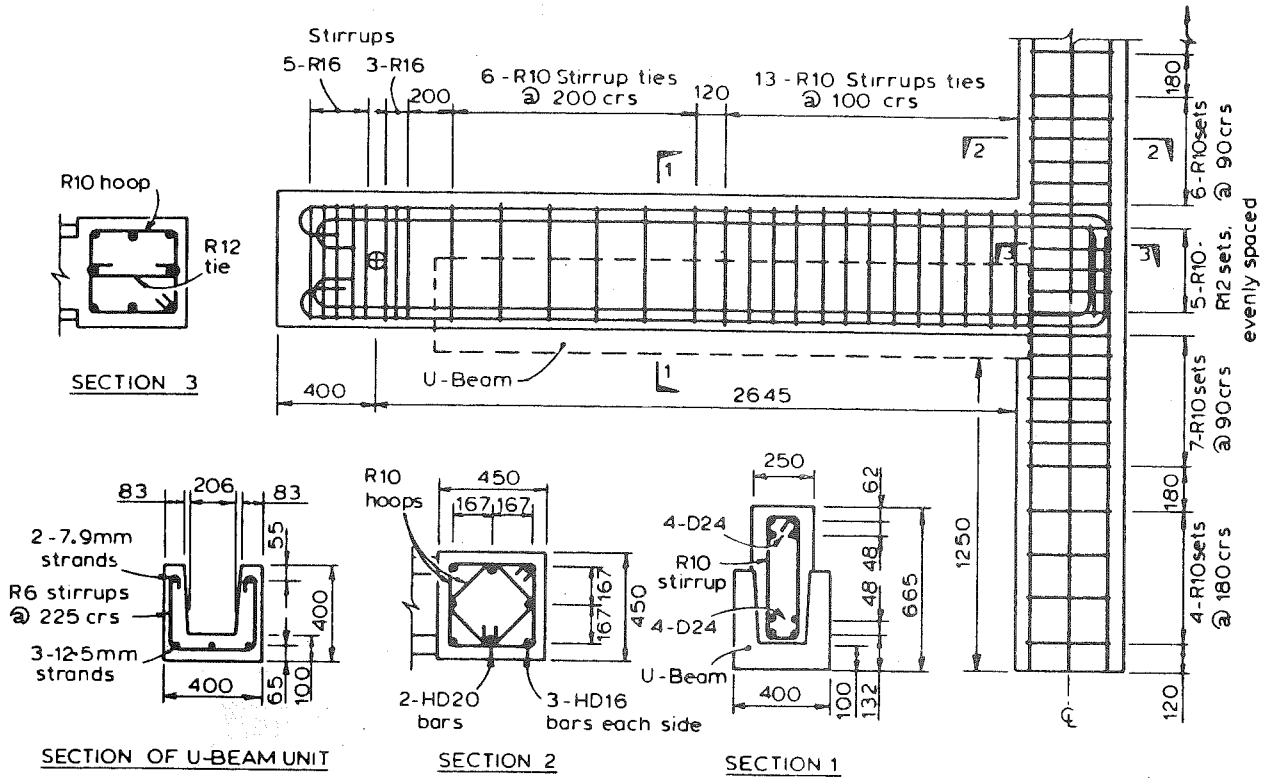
Details of Reinforcement of Units 1 and 3 [4].
